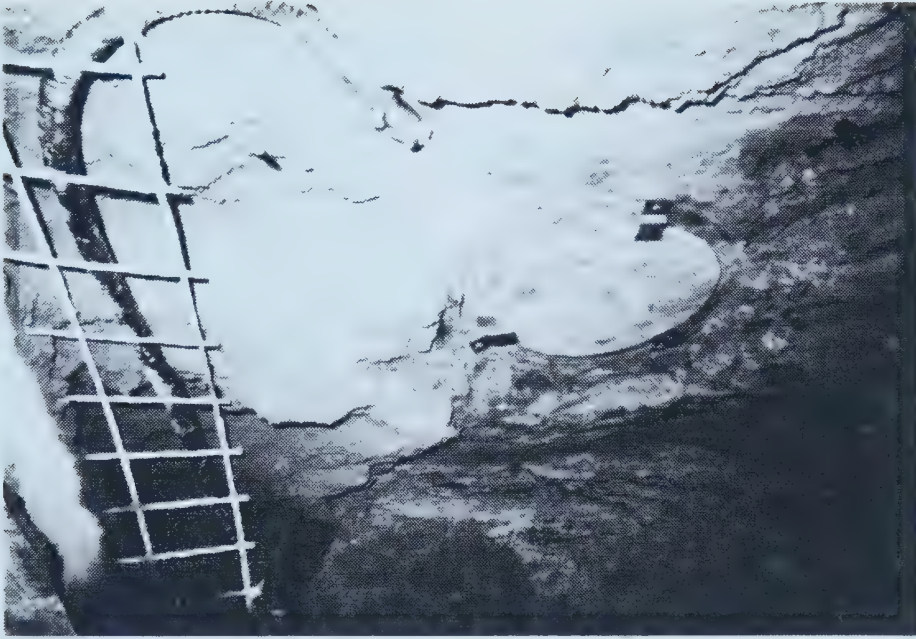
Detail of Total Pressure Cell Fixation to Ground, before Application of Shotcrete
